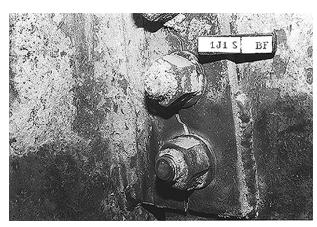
Vertical Fracture through Beam Shear Plate Connection
